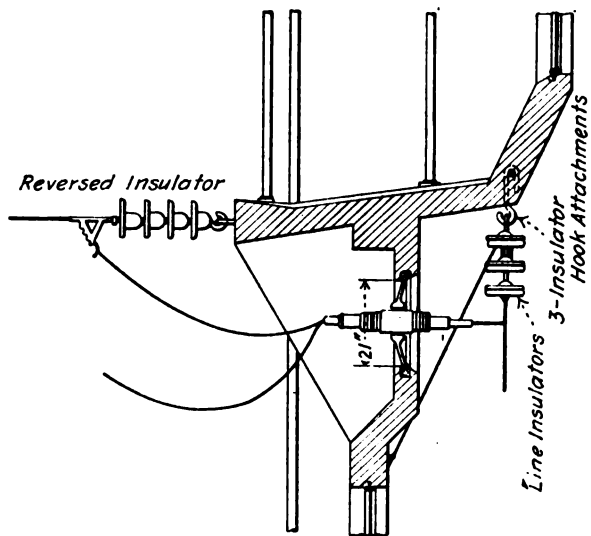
PORTLAND RAILWAY, LIGHT AND POWER CO. ARRANGEMENT OF OUTGOING LINE BUSHING
